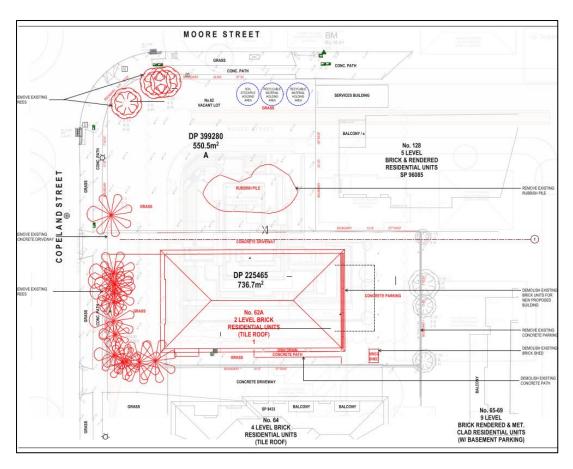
Demolition Plan Extract (Source: CDA Architects)
